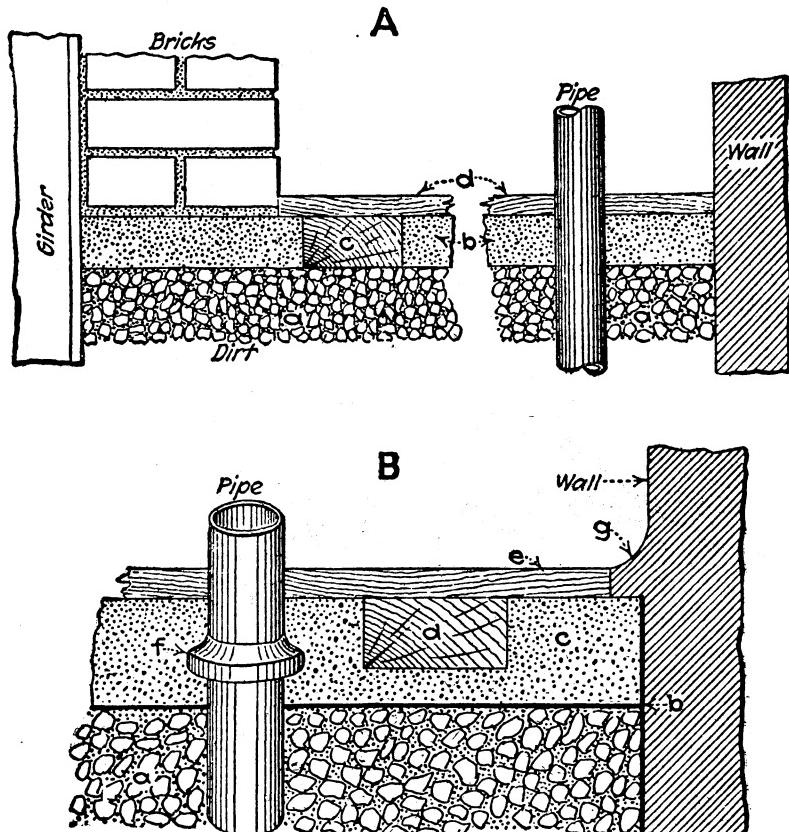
A, Improperly constructed concrete flooring: *a*, Gravel or cinders loosely cemented with coarse concrete, 3 inches thick, but with many crevices and holes; *b*, solid, dense concrete, 2 inches thick; *c*, 2- by 4-inch untreated wood sleeper set in moist concrete over the grout; *d*, $\frac{3}{8}$ -inch pine flooring nailed to sleepers. B, Properly constructed concrete flooring: *a*, Gravel or cinders loosely cemented with coarse concrete, but with many crevices and holes; *b*, coal-tar pitch waterproofing $\frac{3}{8}$ inch thick; *c*, dense concrete, 3 inches thick; *d*, 2- by 4-inch treated wood sleeper set in a groove in concrete which insulates it from termites in the earth; *e*, $\frac{3}{8}$ -inch flooring nailed on sleepers; *f*, metal collar around pipe which runs down through the concrete (this collar should be soldered to the pipe and embedded in the concrete); *g*, shoulder of concrete at point of wall and concrete floor to avoid a right-angle connection and consequent cracking.
